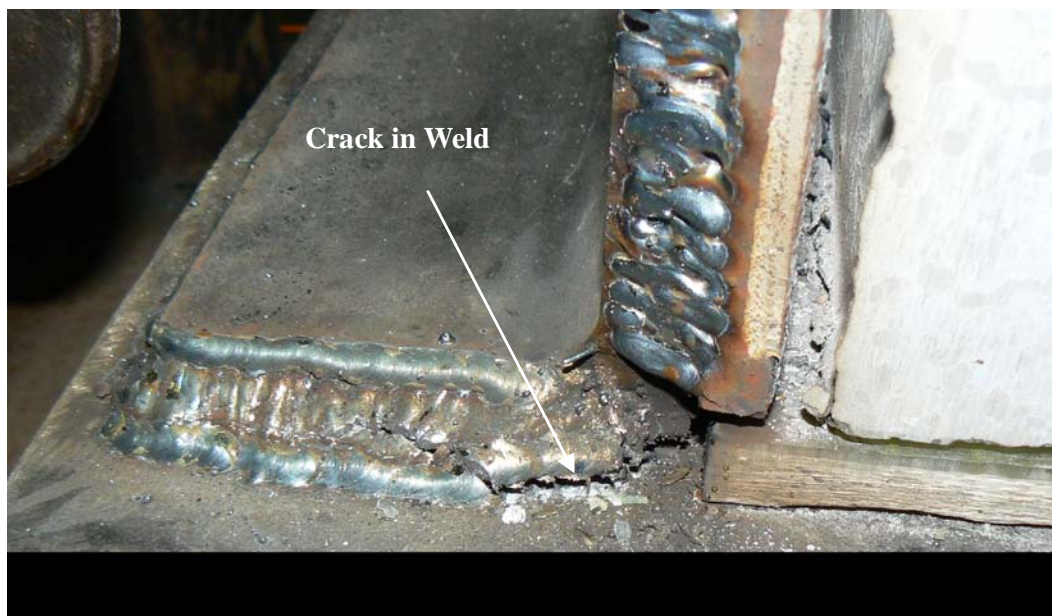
Weld fracture at base connection for UHPC test unit L1 at 3.0 percent drift
